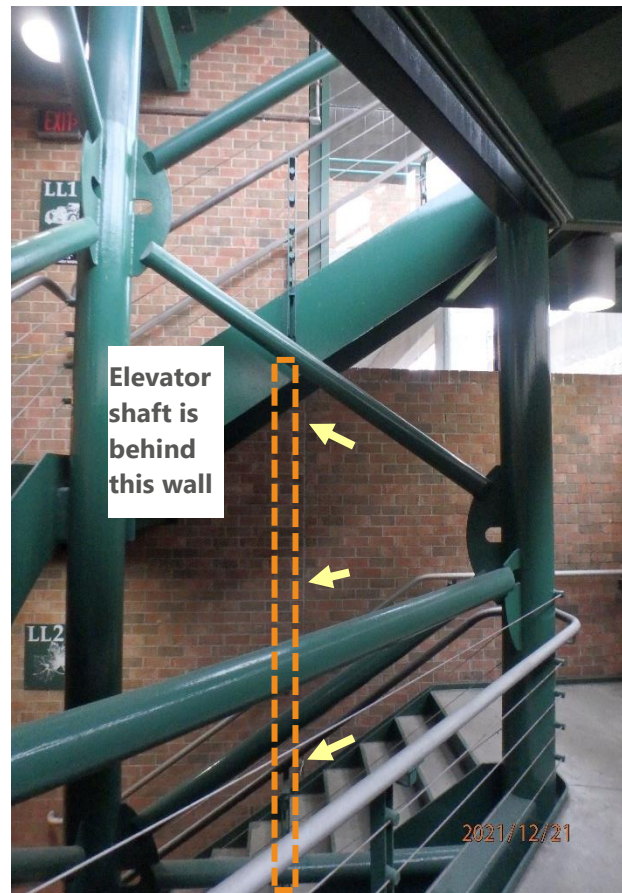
Control joint within stairwell (yellow arrows). Target area for vertical cut off injection is where brick masonry overlaps the east cast-in-place concrete wall of the elevator. Installation is proposed from elevator shaft to minimize injection grout staining on masonry.
